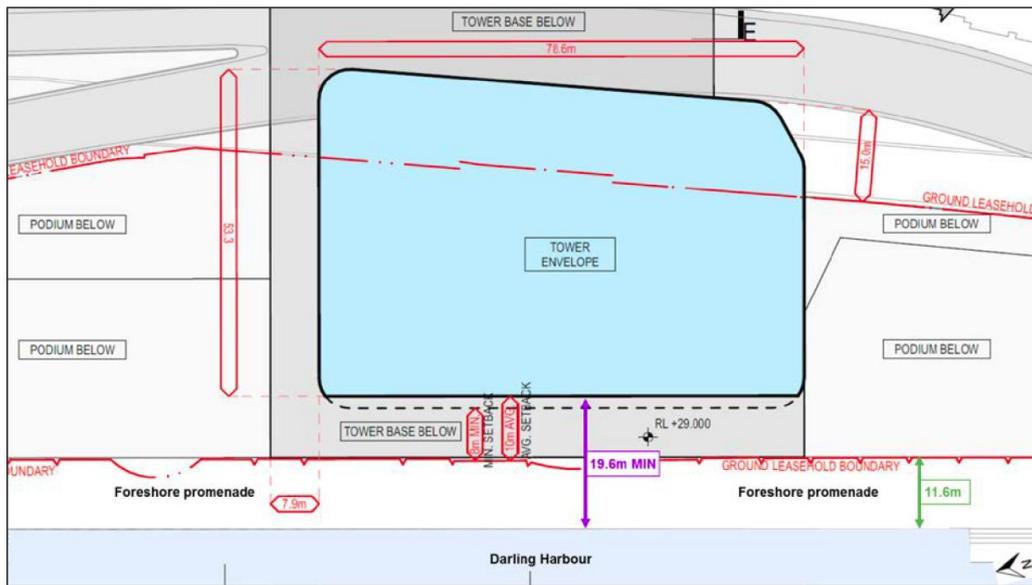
| Tower envelope minimum and average setback from the promenade (red) and minimum setback from Darling Harbour (purple) (Base source: Applicant's RtS)
